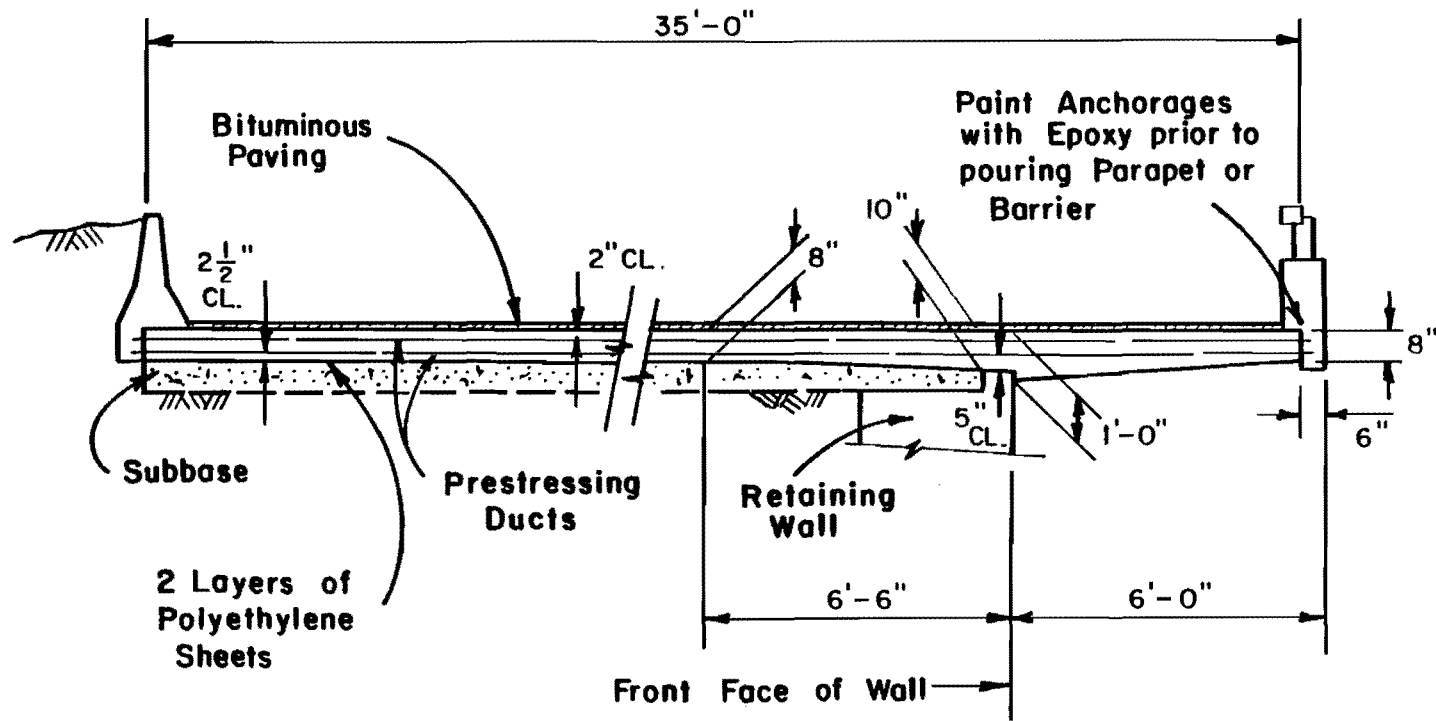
Section of prestressed roadway slab for I-70 through Glenwood Canyon, Colorado [40]
